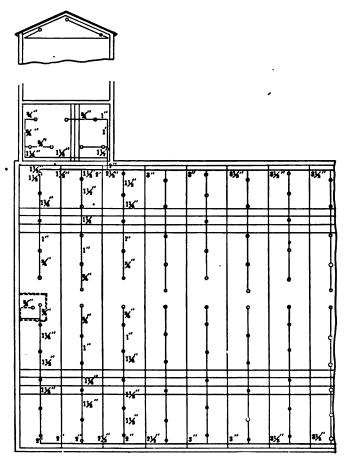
Plan Showing Arrangement of Ceiling Sprinklers, North Albany Car House, United Traction Company.
